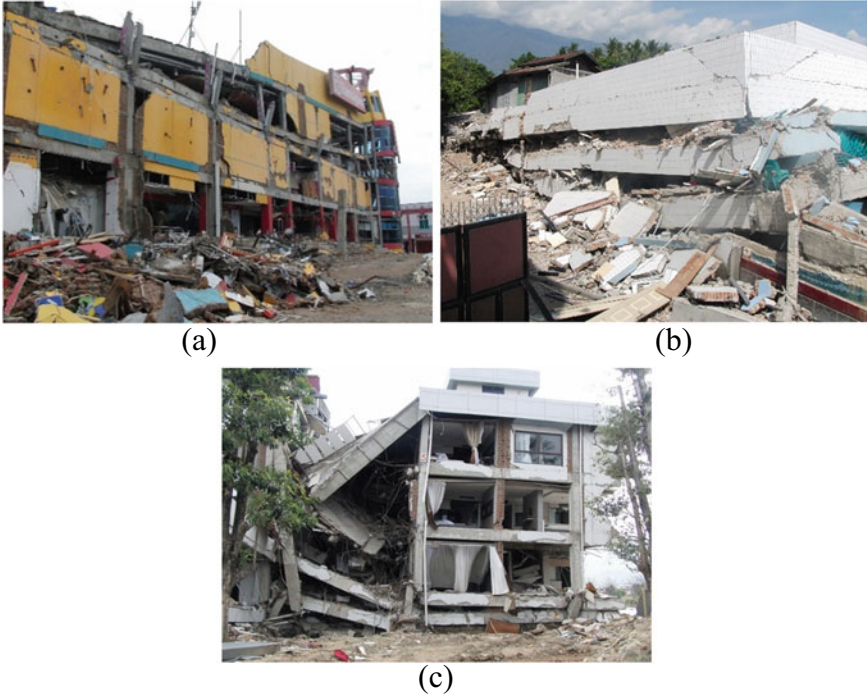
Soft storey failure at a Ramayana Shopping centre, b Dunia Baru restaurant, c Mecure Hotel at Palu Indonesia [1]
